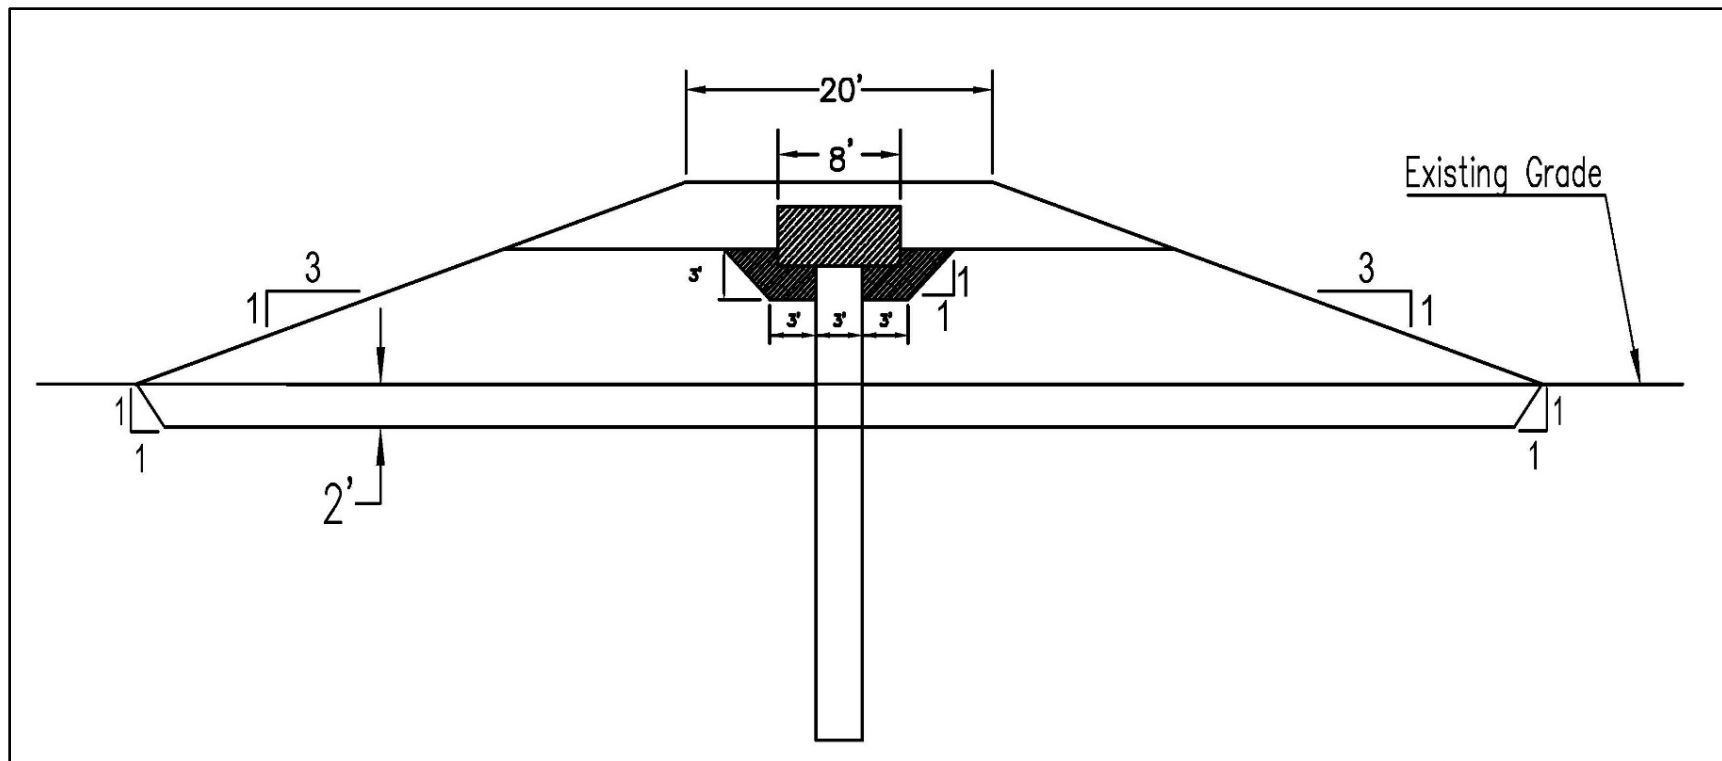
Typical setback levee cross-section for the Bear River Setback Levee Project (Source: AECOM).
